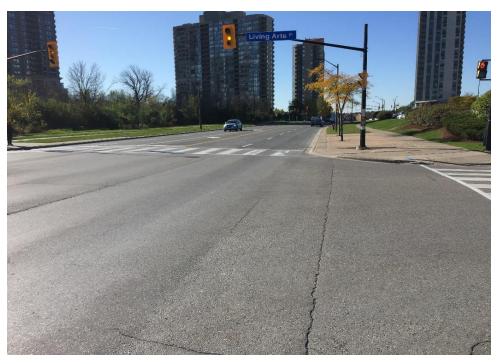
Existing Access Road/future Extension of Living Arts Drive, eastbound lane, about 45 m west of Rathburn Road West, looking west, showing moderate edge cracking associated with alligator cracking, slight to moderate longitudinal and transverse cracking (partially sealed).
